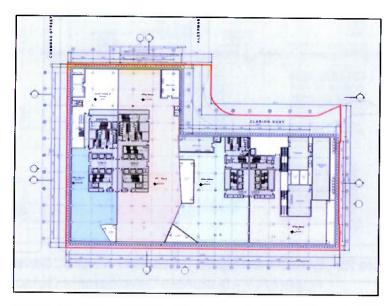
Proposed Lower Ground Floor [FFL = -0.575]
